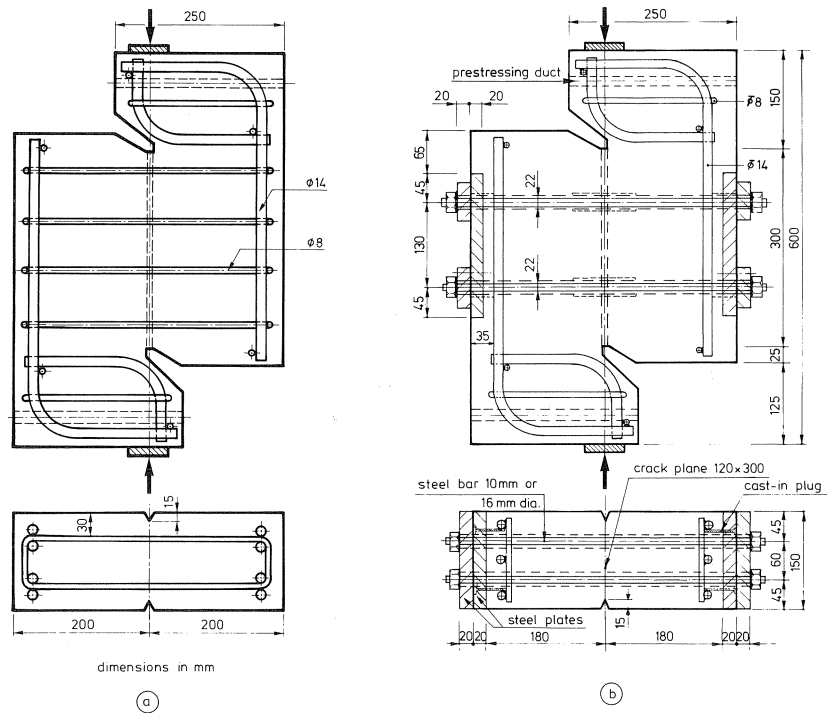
Details of push-off specimens with a single crack for (a) reinforced concrete and (b) plain concrete restrained by rods.
